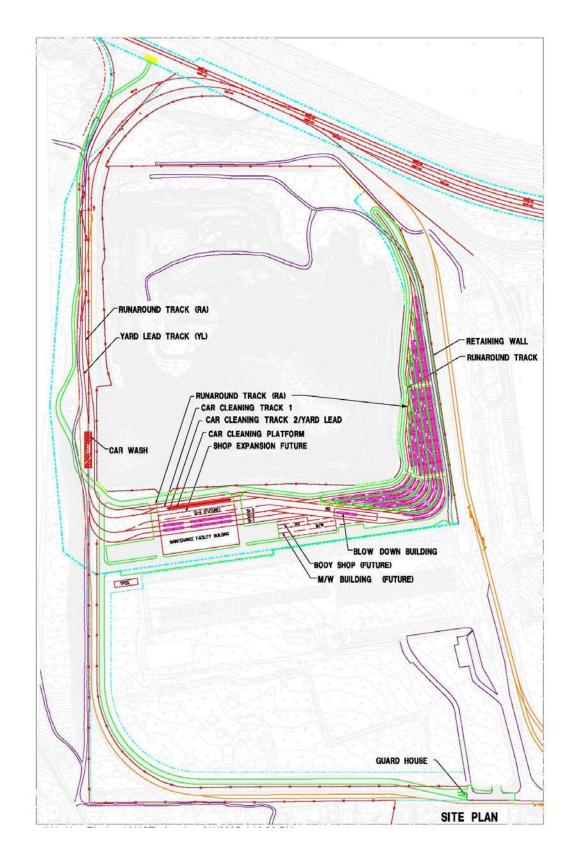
Site Plan: Maintenance and Operations Facility, Irwindale
